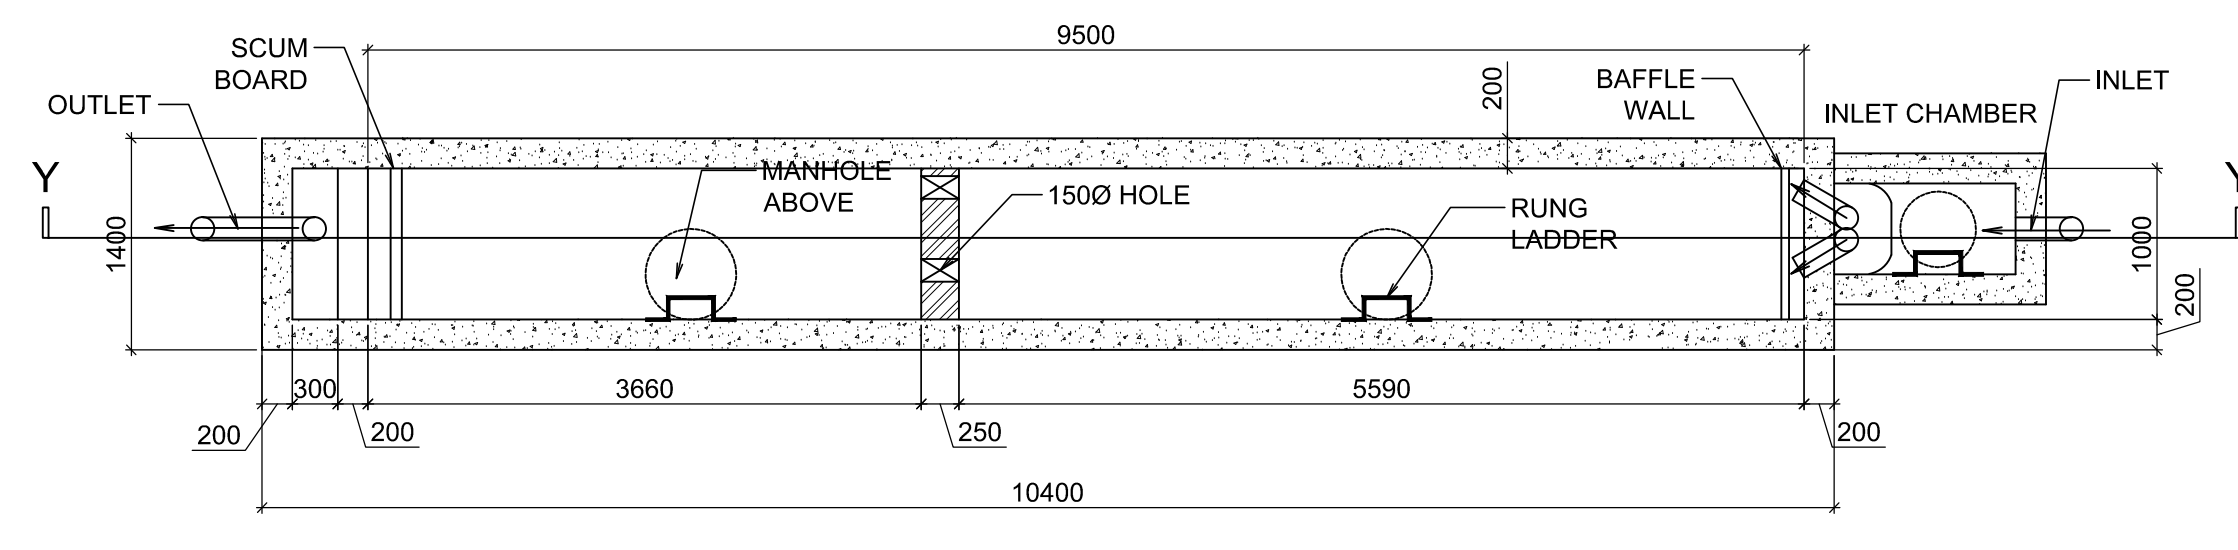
DETAIL SECTION OF UNDER GROUND WATER RESERVOIR- XX
